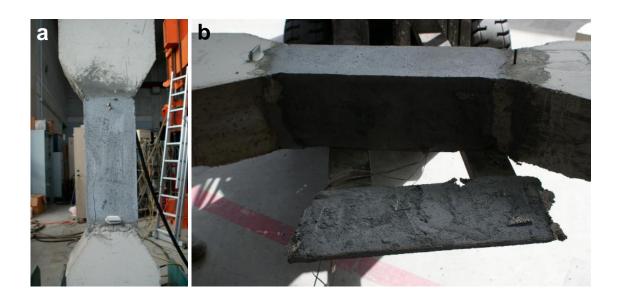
a) Failure mode: Specimen R3 (repaired column with Class R3 mortar without bonding agent); b) Detachment of one of the repair mortar layers after the test.
